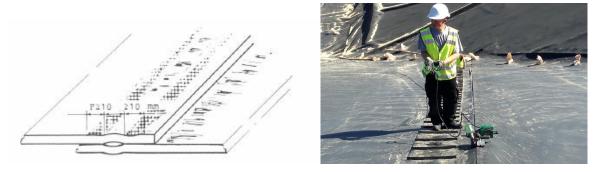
Double welding of a HDPE liner. The welding can be tested by applying pressurized air to the air channel between the welding seams.
